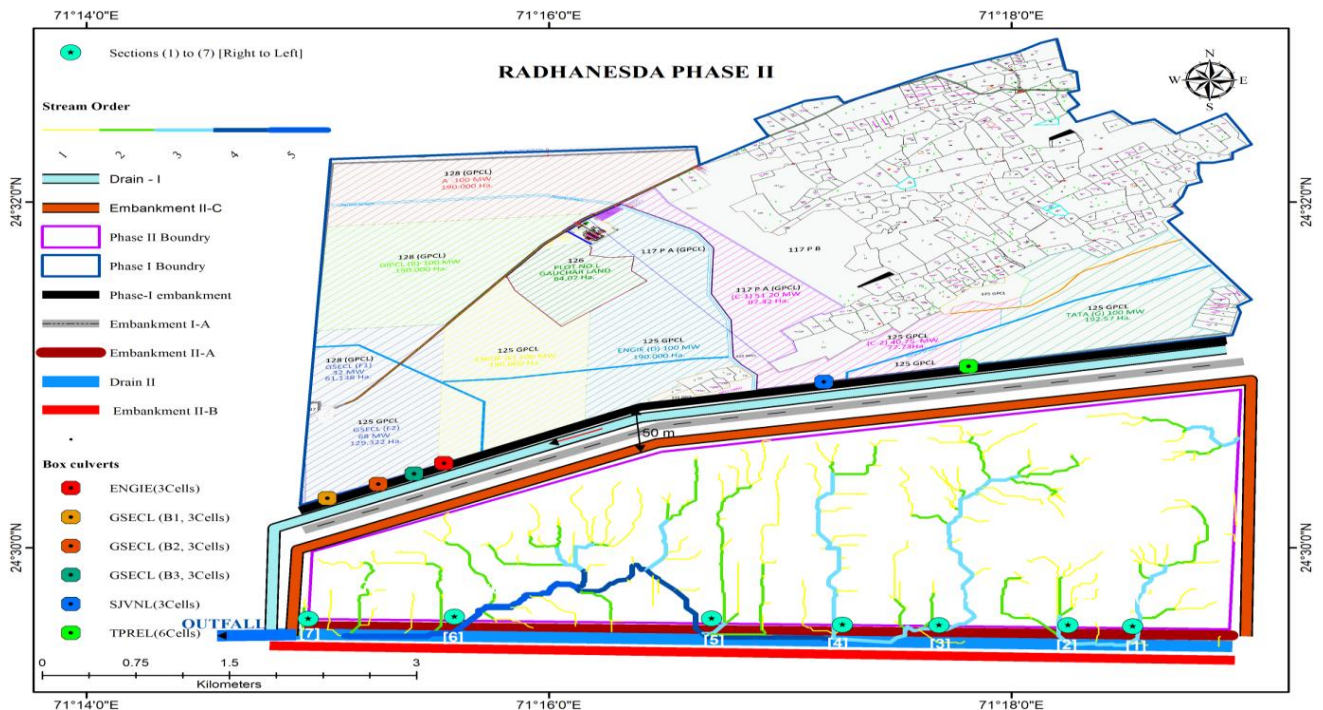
Location of box culverts, embankment, and main drain (drain-I) in phase I and location of seven outfall locations of nalas in embankment II-A and main Drain-II of phase II
